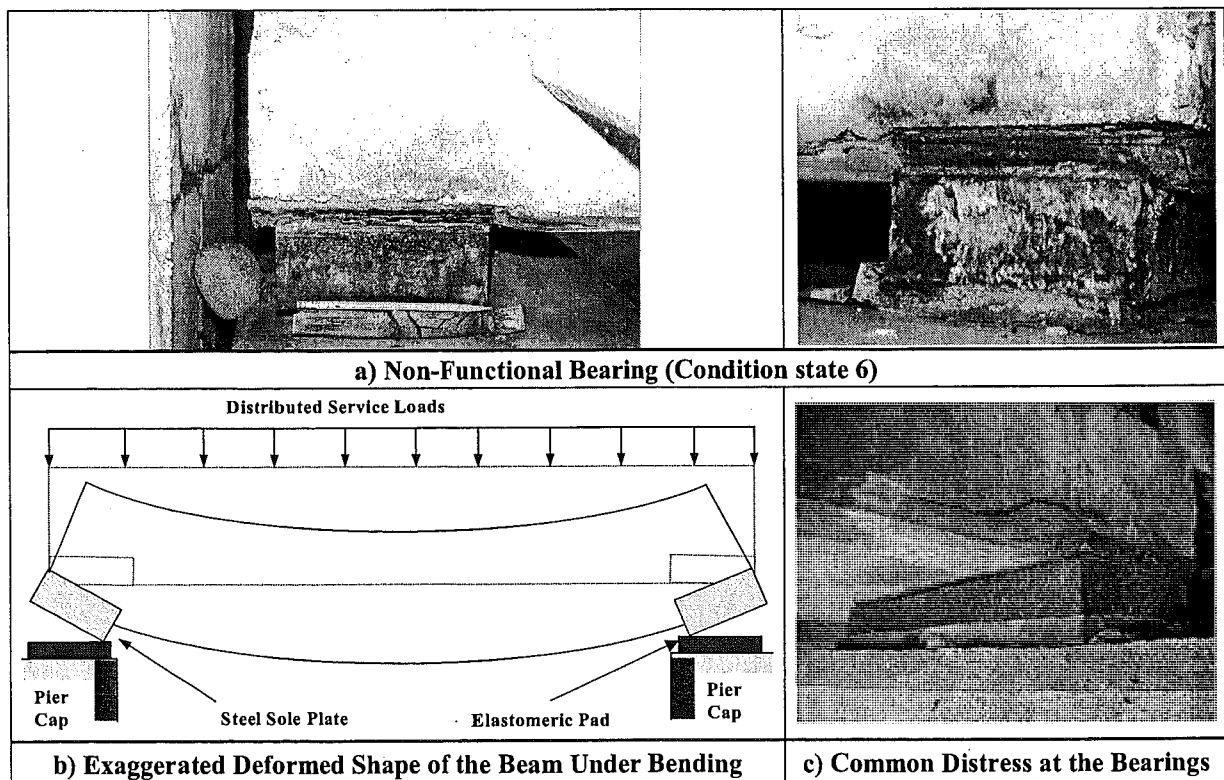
a) Condition of the Elastomeric Bearing Pads; b) the Exaggerated Deformed Shape of a Girder under Flexural Bending; c) Common Distress Observed at the Bearings
